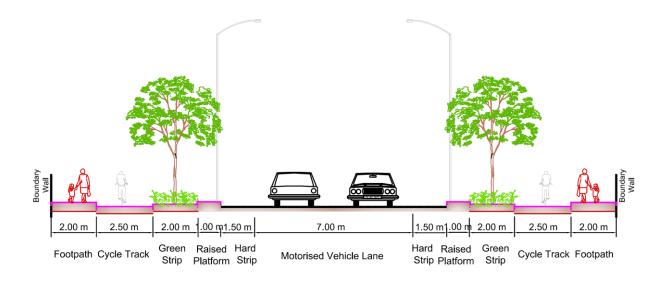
Typical Road Cross Section of a 25m Wide Road
